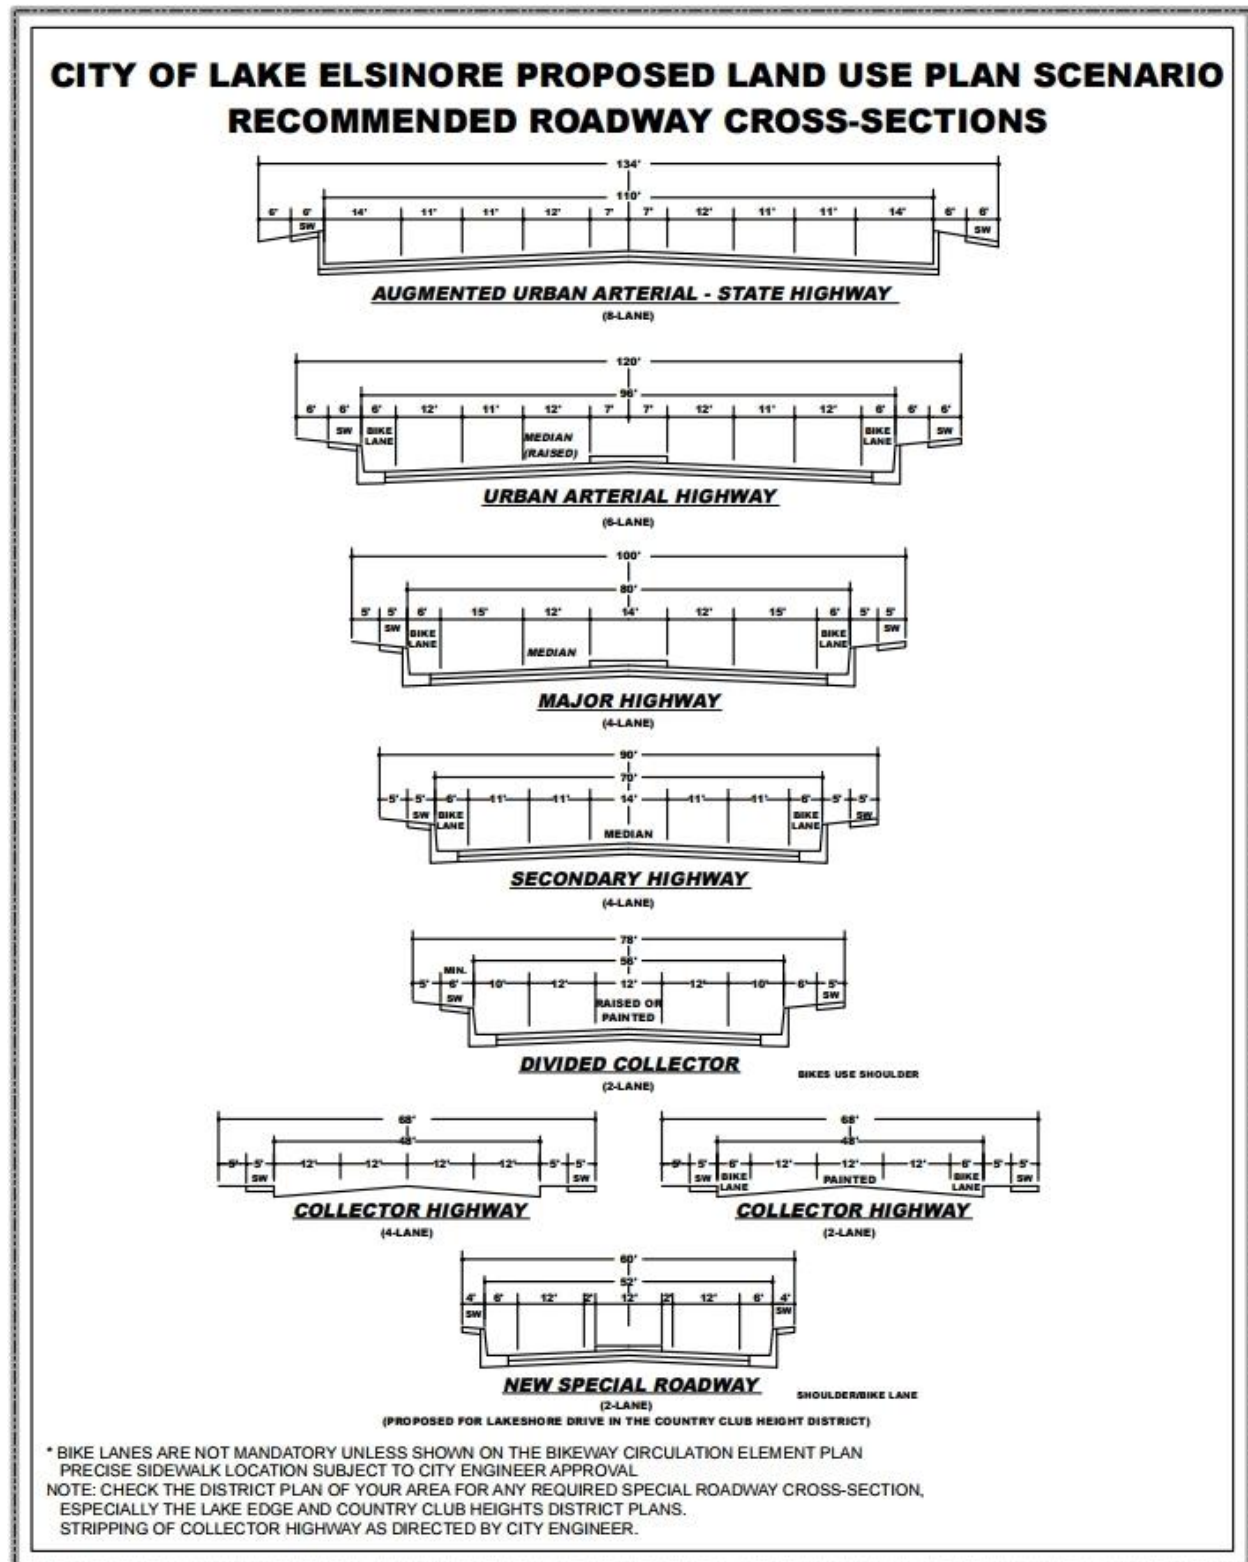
General Plan Recommended Roadway Cross Sections.
